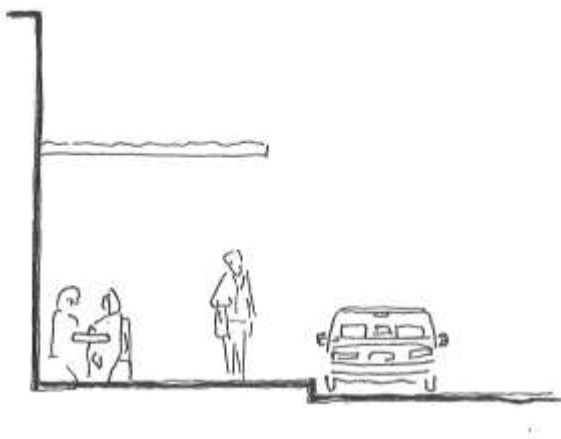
Cross section of alfresco dining on arterial/collector roads
